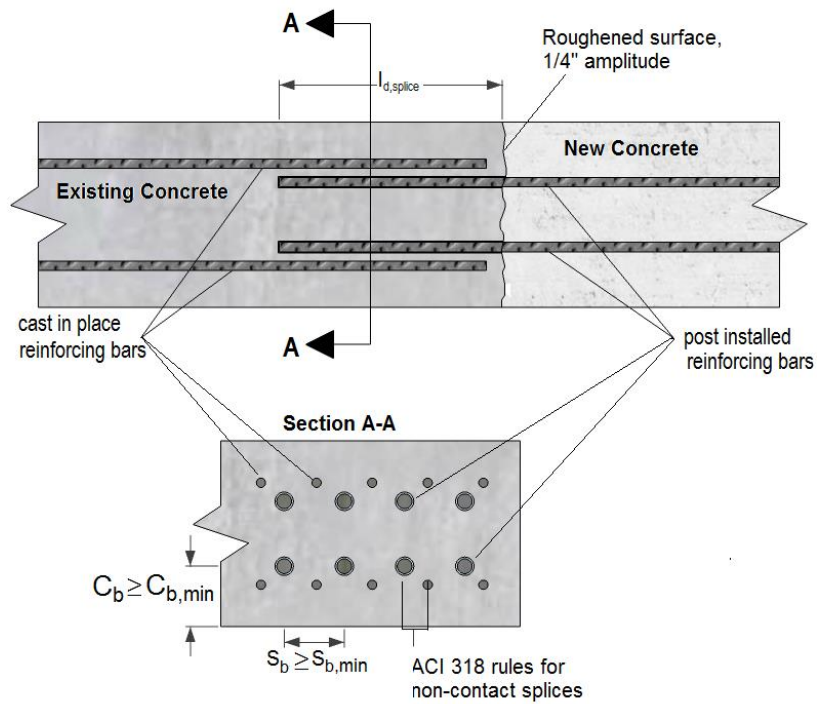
INSTALLATION PARAMETERS FOR POST-INSTALLED REINFORCING BARS
